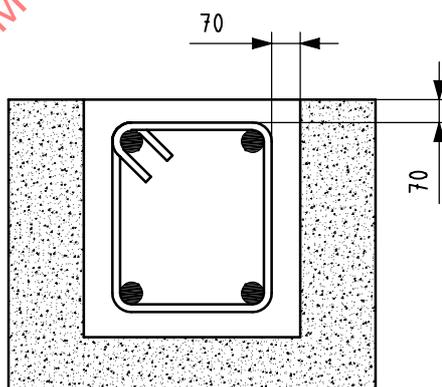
All types of reinforcement of elements cast and permanently exposed to earth — Minimum concrete cover 70 mm
